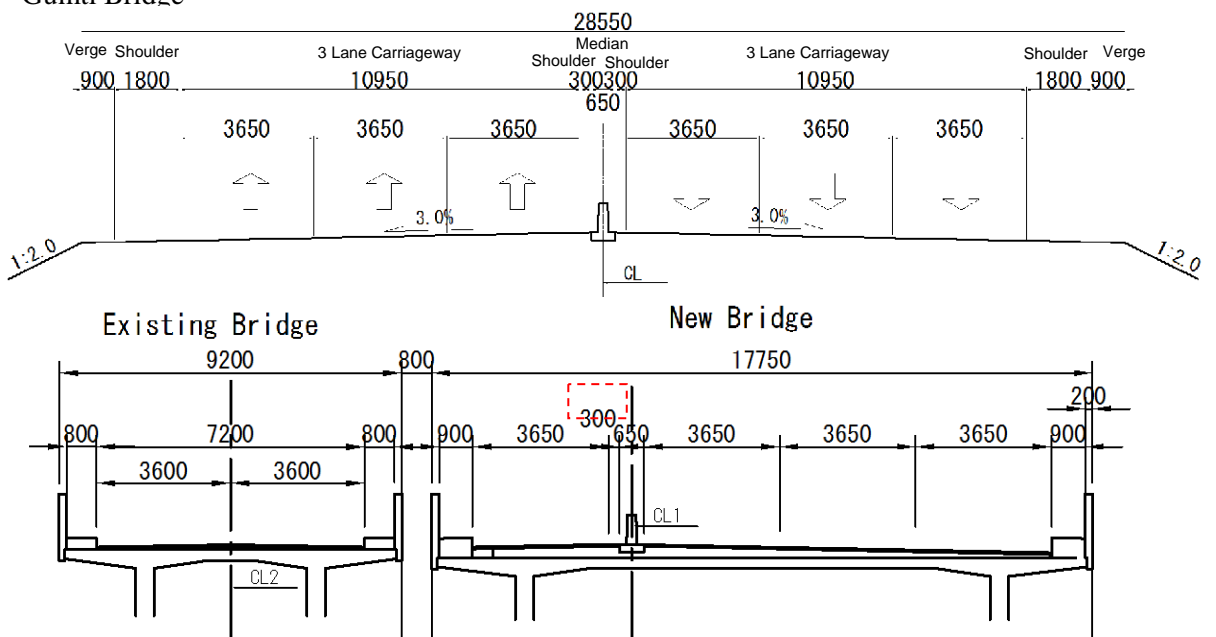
Typical Cross Section for Gumti Bridge
